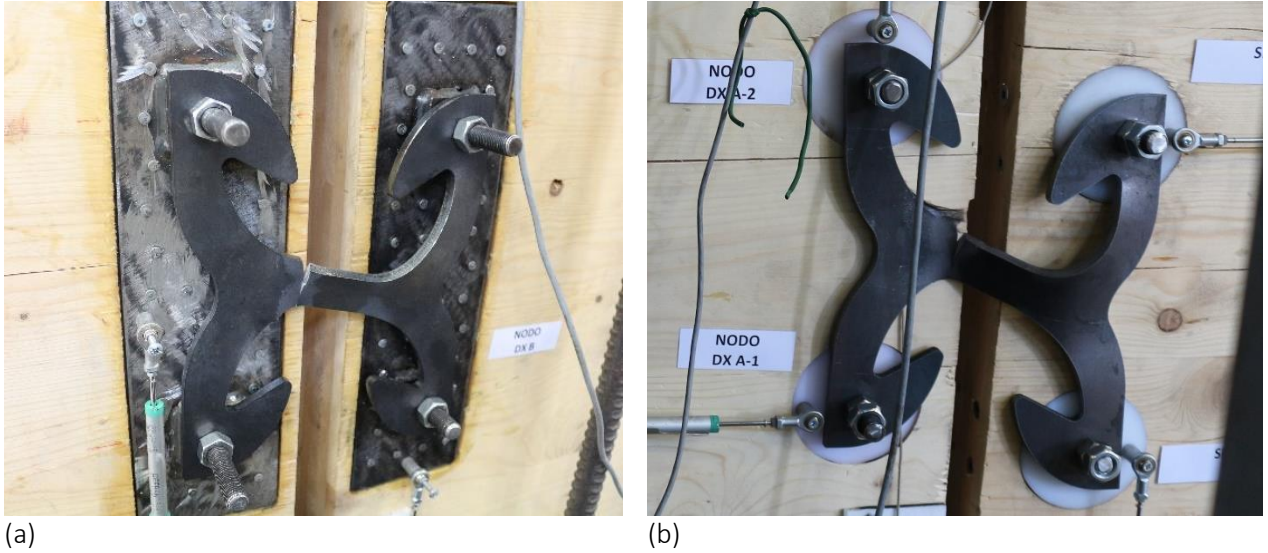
Failure modes of the dampers for (a) NP and RNP fastenings and (b) SB fastening.
